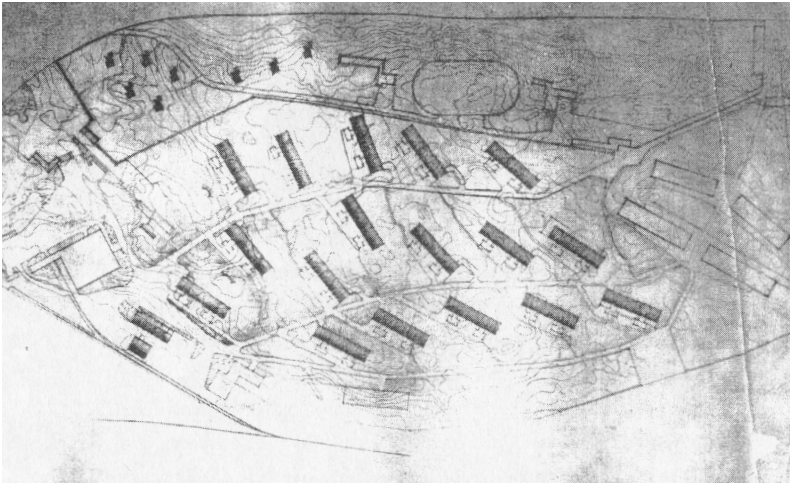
Site plan of the Oy Stromberg Ab factory.
